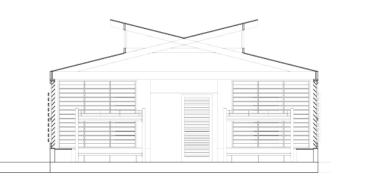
Proposed Cabin, Transverse Section (NTS) (by author, 2010)
